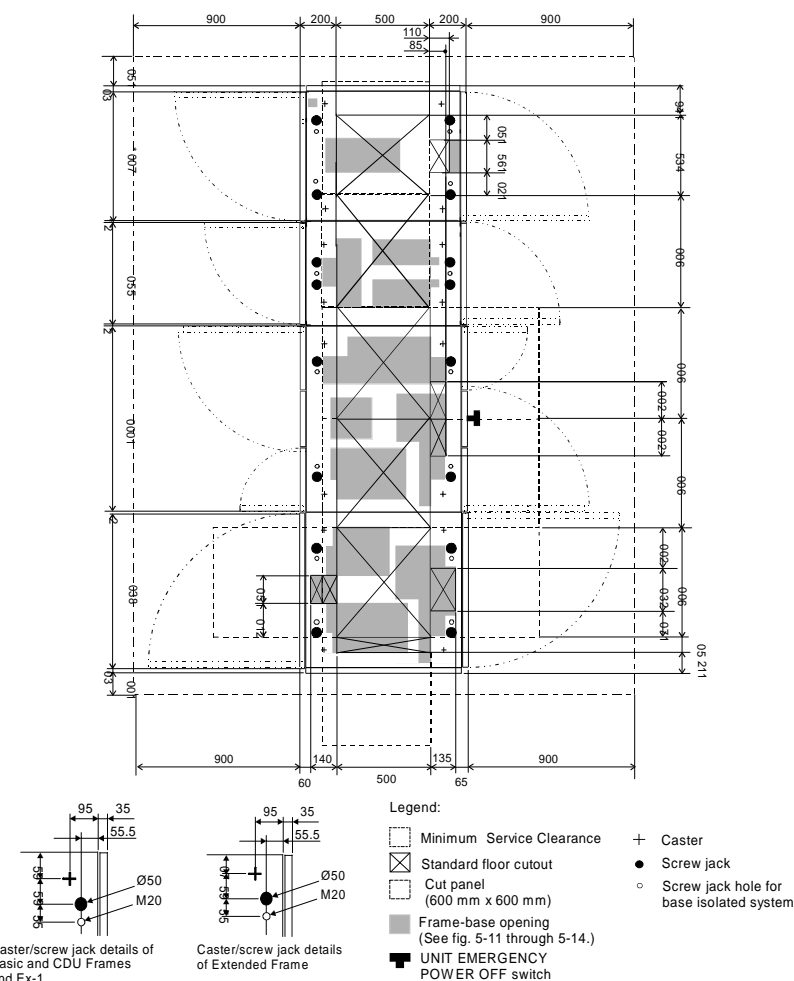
Processor Unit Floor Plan, F-7E Turbo—Basic and CDU Frames and Ex-1
